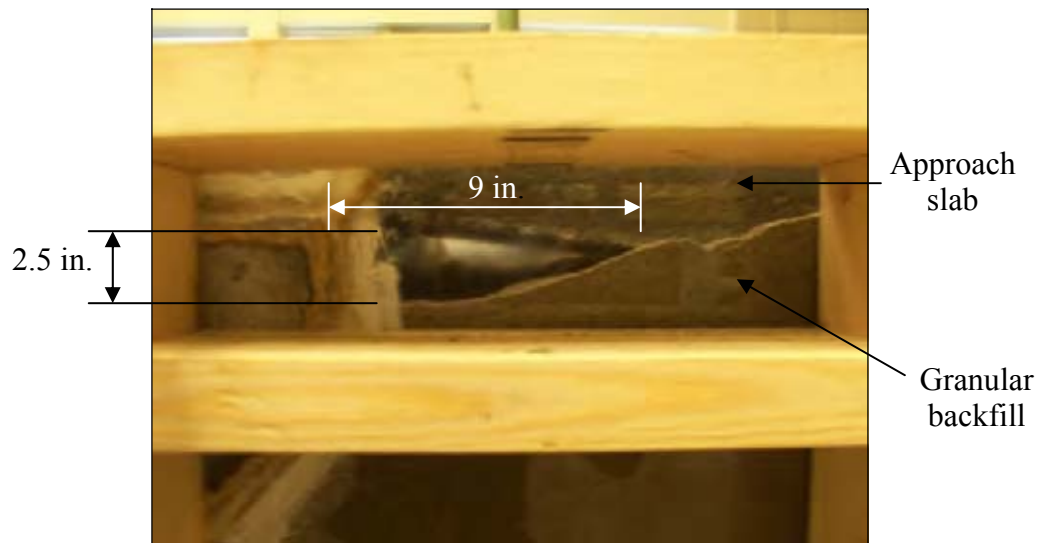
A void 2.5 in. deep and 9 in. long developed under the approach slab
